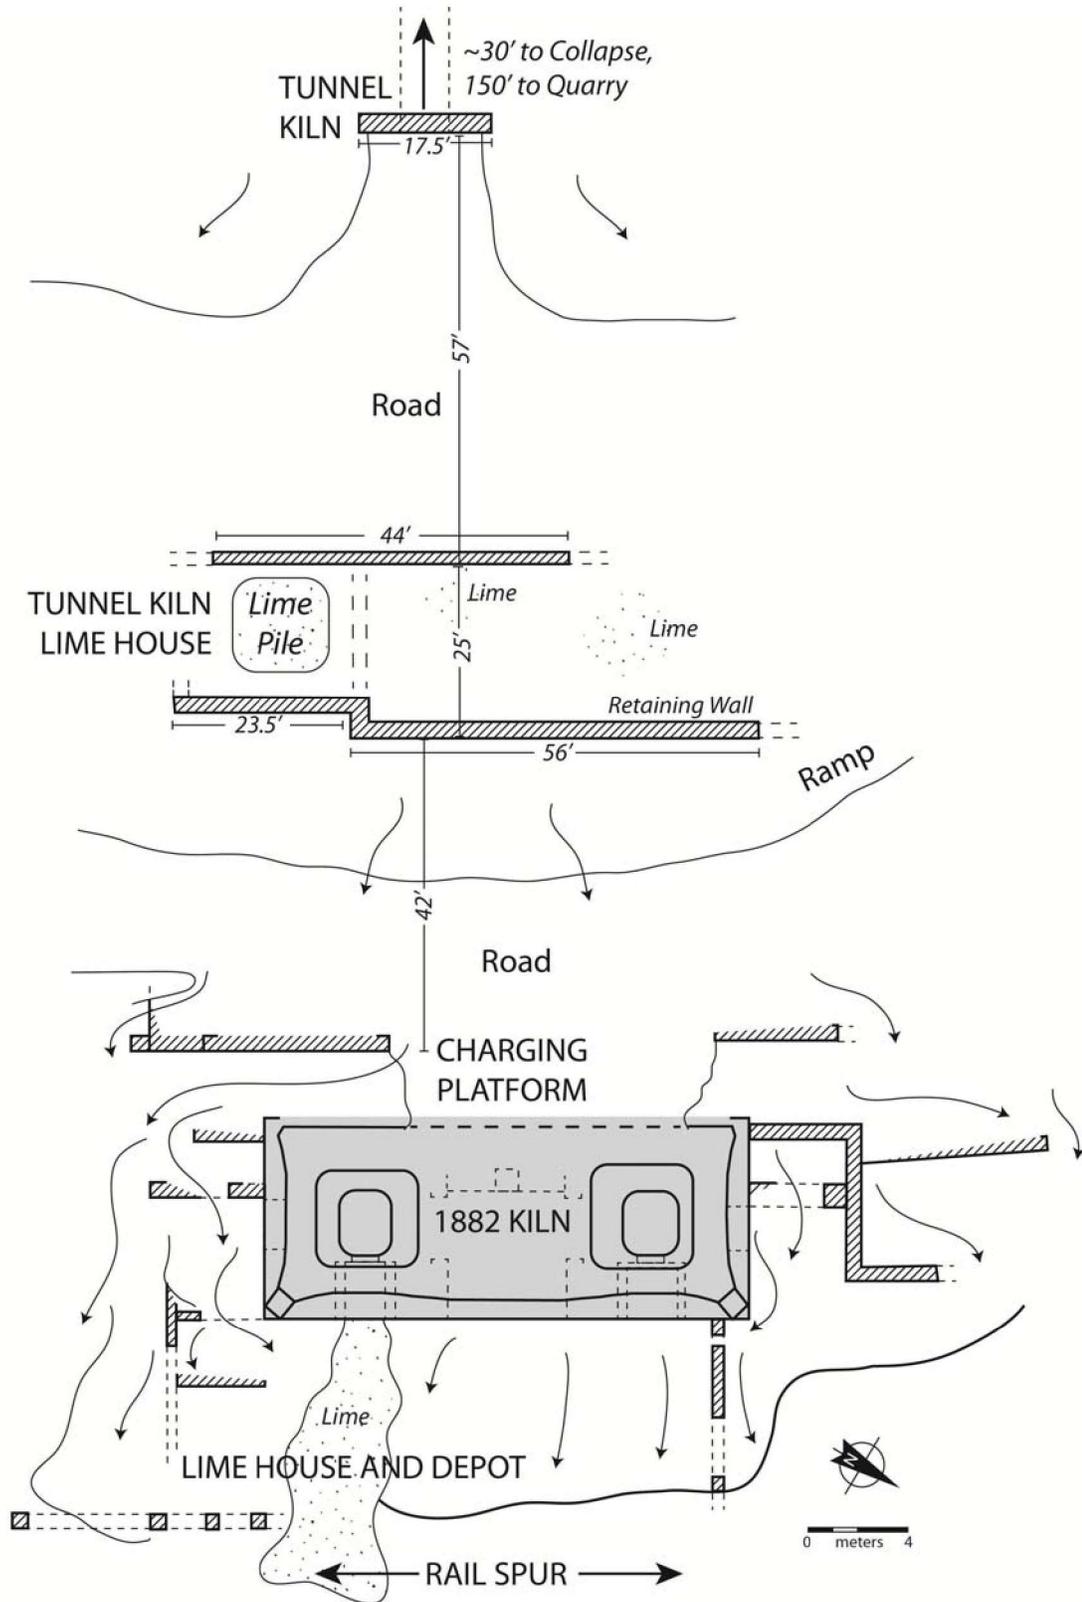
PLAN OF 1882 KILN AND TUNNEL KILN FEATURES
